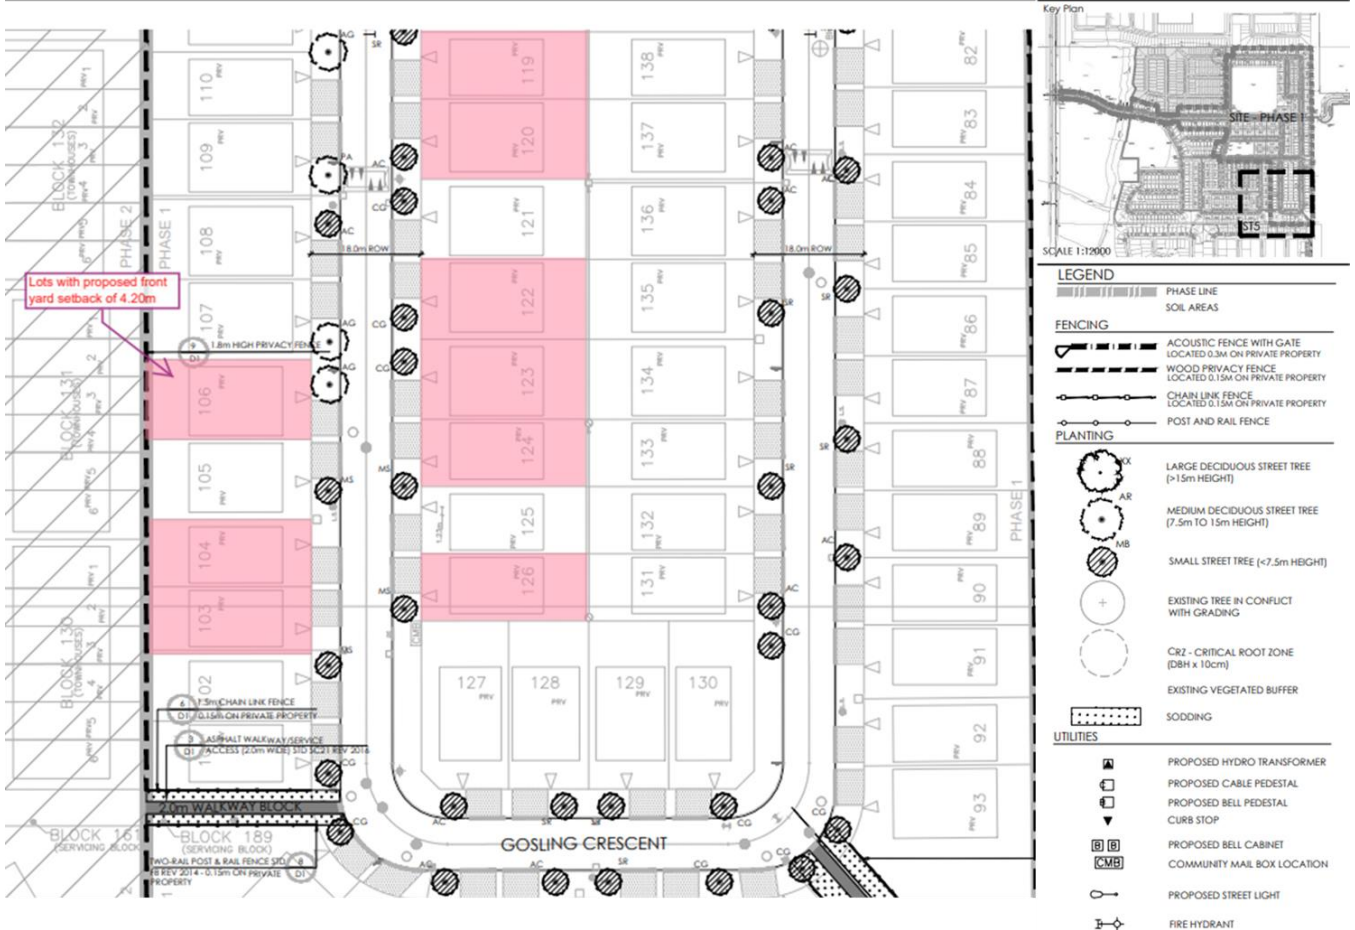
Lots with proposed front yard setback of 4.20m indicated on the Streetscape Plan for Phase 1
